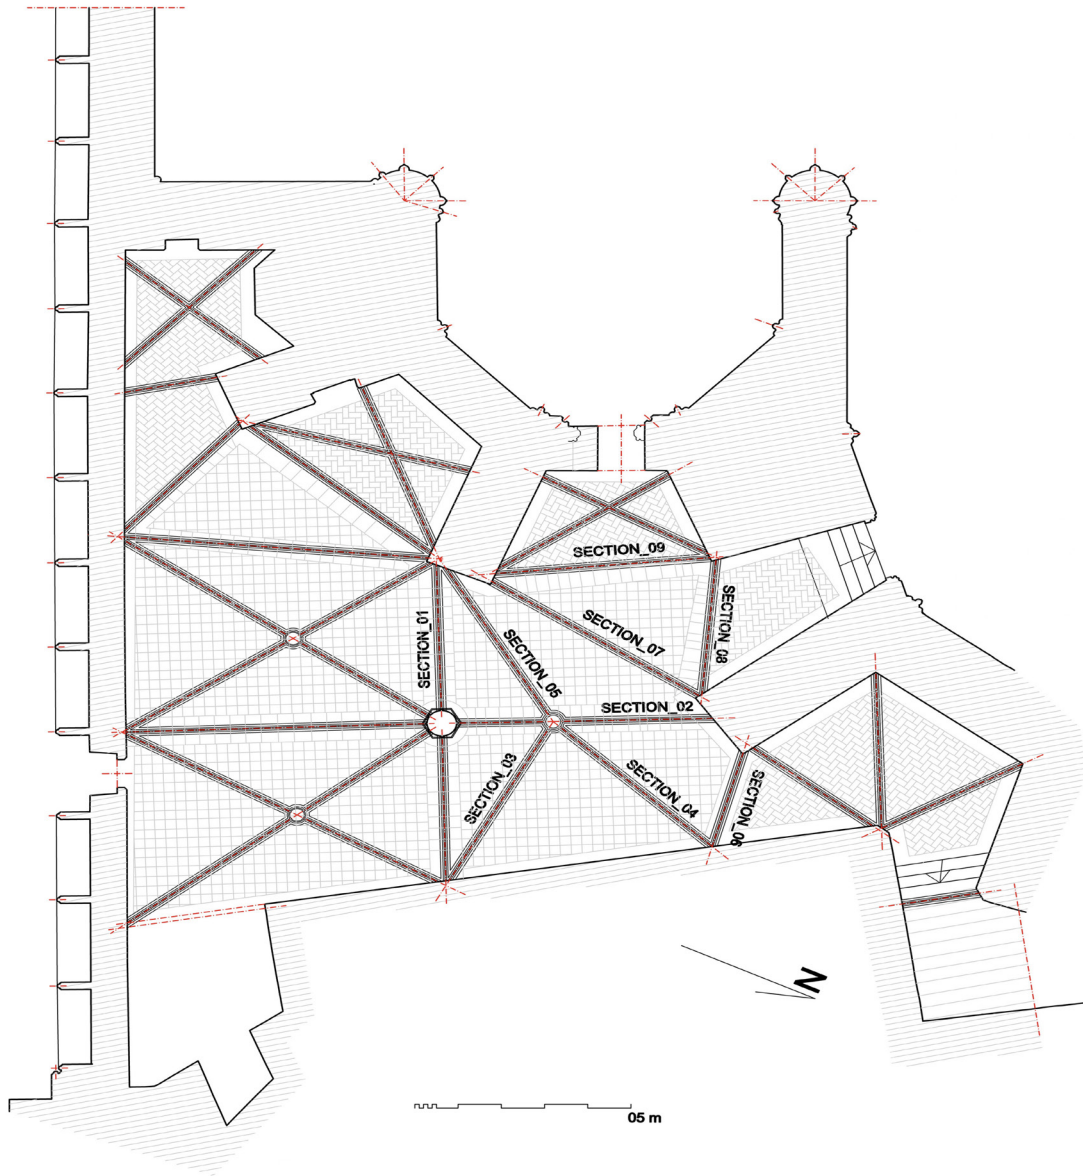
Guillem Sagrera. Floor plan of the Chapter House, Cathedral of Saint Jean Baptiste, Perpignan (graphic elaboration by the authors).
